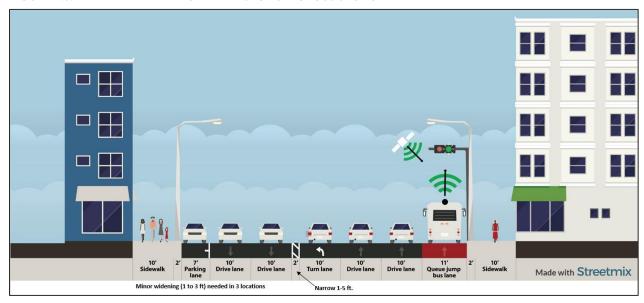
ALTERNATIVE 1 TYPICAL INTERSECTION CROSS SECTION
